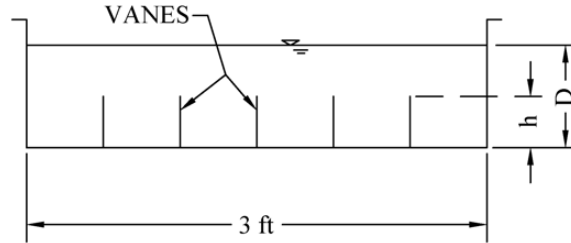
Metal vane array structure backwater and vertical mass transport plan and elevation diagram.
